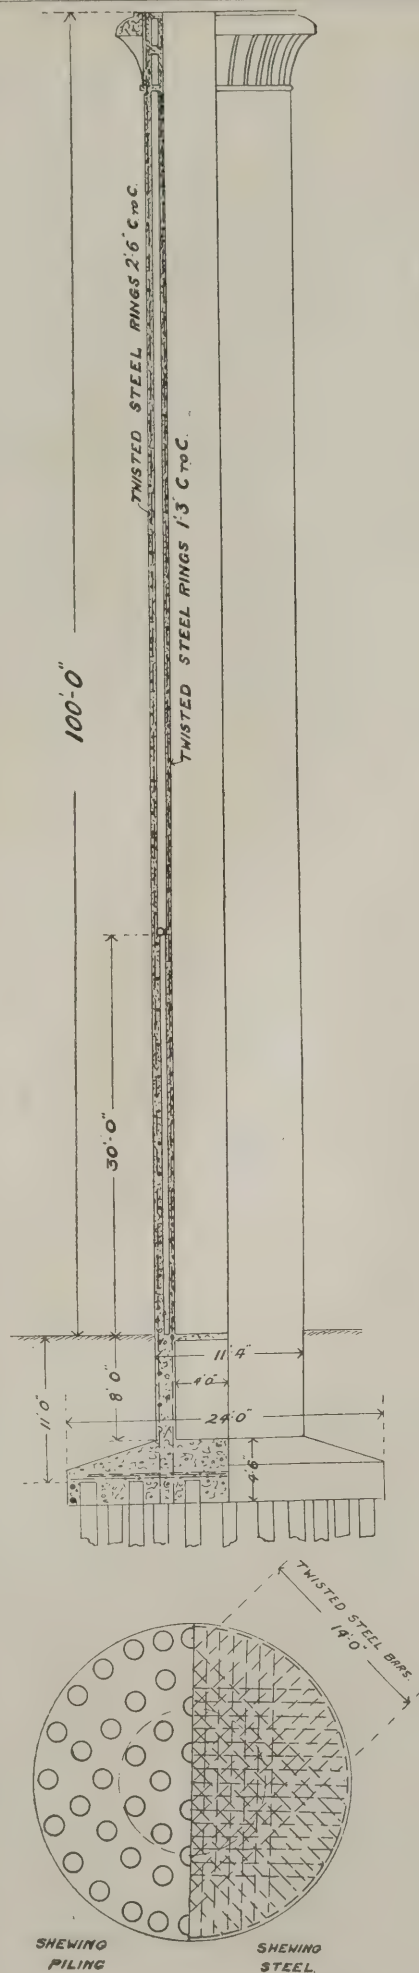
REINFORCED CONCRETE CHIMNEY, JERSEY CITY, N.J.
